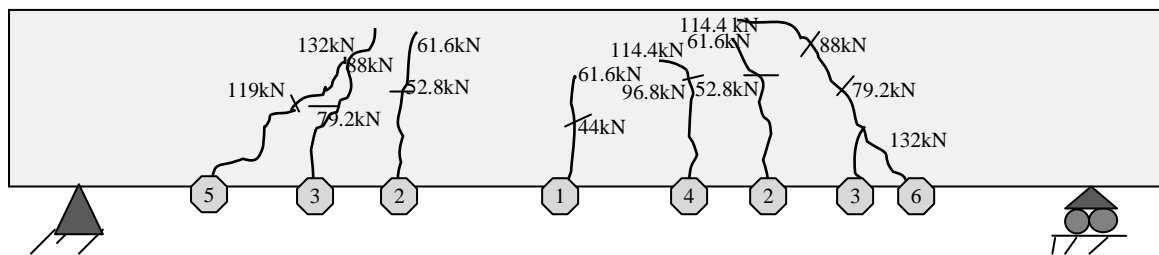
Final crack pattern of 2.5% bamboo reinforced beam
